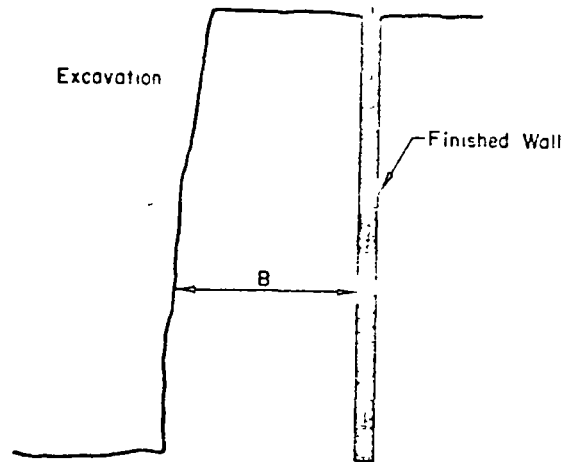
Typical Layout for Cushion Blasting (After DuPont Blasters Handbook, 1966)
